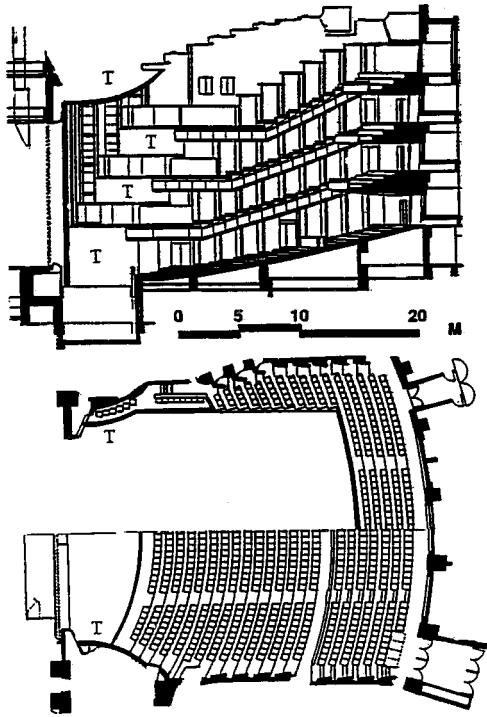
The NNT opera house as built. (Upper) Longitudinal section drawing. (Lower) Plan drawings of main floor and first balcony. The “T”’s show the trumpet reflecting surfaces.
